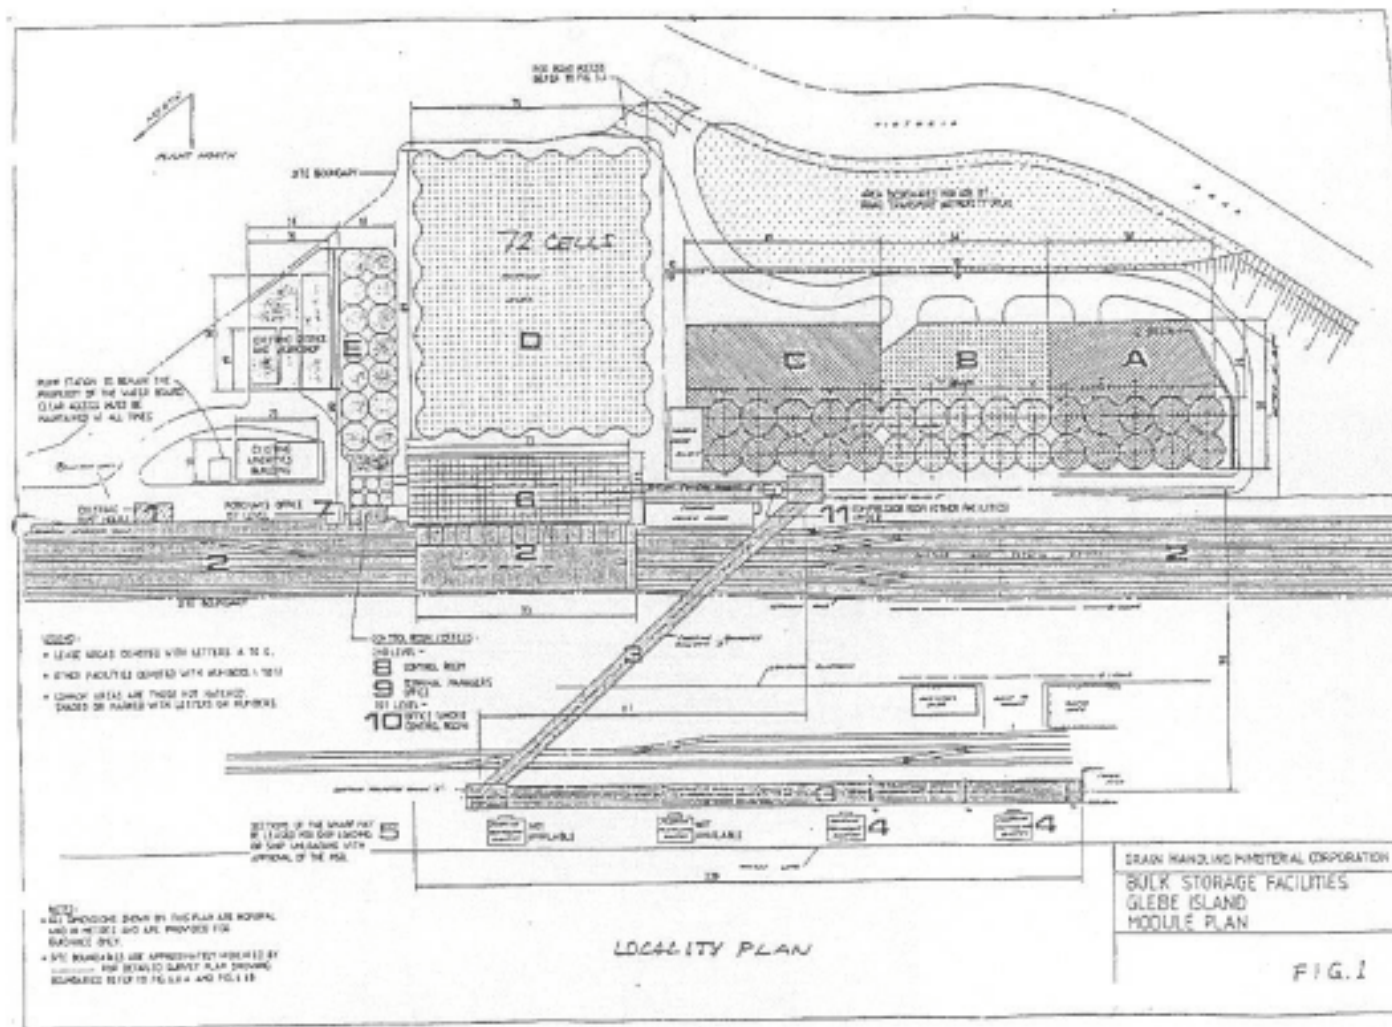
Historic plan of the Glebe Island Bulk Wheat Storage Facilities, prior to the demolition of the sections marked D, E, 6 and 2.
